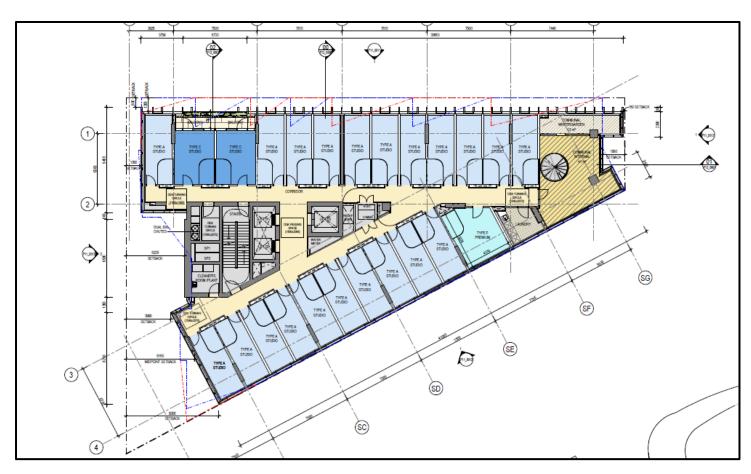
Excerpt from Level 06 Floor Plan (podium tower level) (S.57A Amended Plans)
